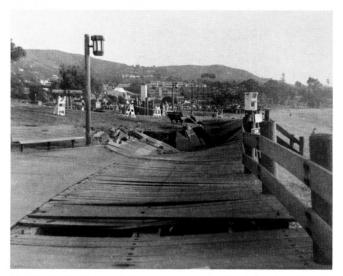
Sections of the main boardwalk at Laguna Beach collapsed after heavy wave surge eroded the sand and undermined piling foundations.
